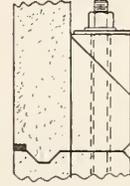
depicts some of the fastening details for attaching the bridge decks to the various girders and other structural members of the bridge assembly. Concrete girder-bridge deck
